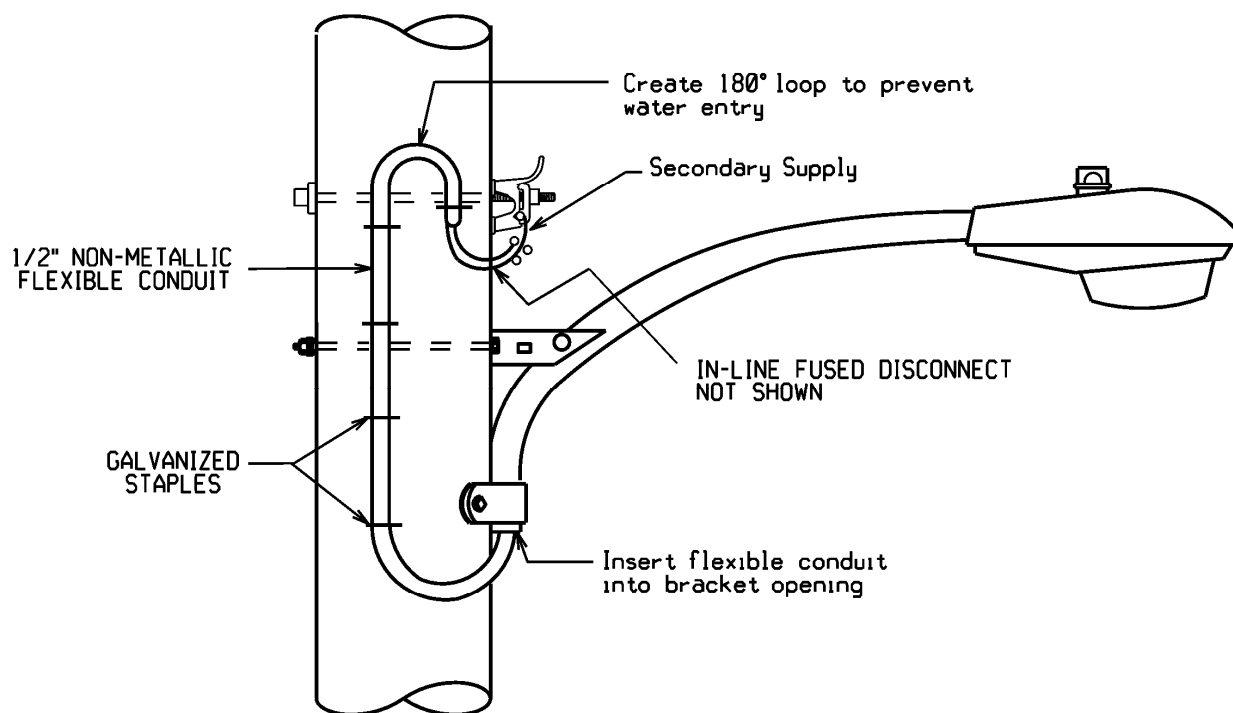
Mechanical Protection for Overhead Supplied Outdoor Light Fixture Conductors
